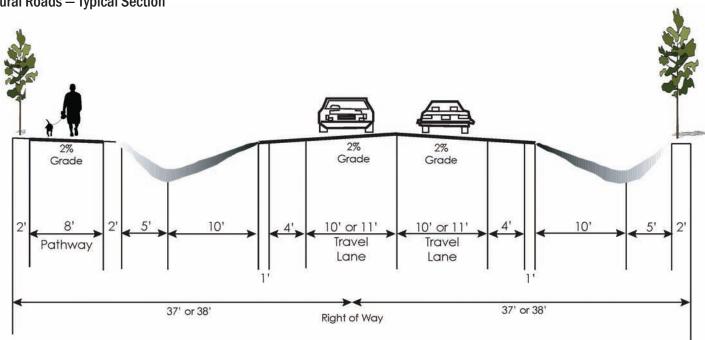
is the typical section for a rural collector. For local secondary roads, a typical section would have a 50-foot right-of-way and would include 20- to 24-foot surface widths (10- to 12-foot travel lanes), depending on average daily traffic (see Table 4.5). These local roads would include 2- to 4-foot shoulders, wide enough to accommodate pedestrians.
